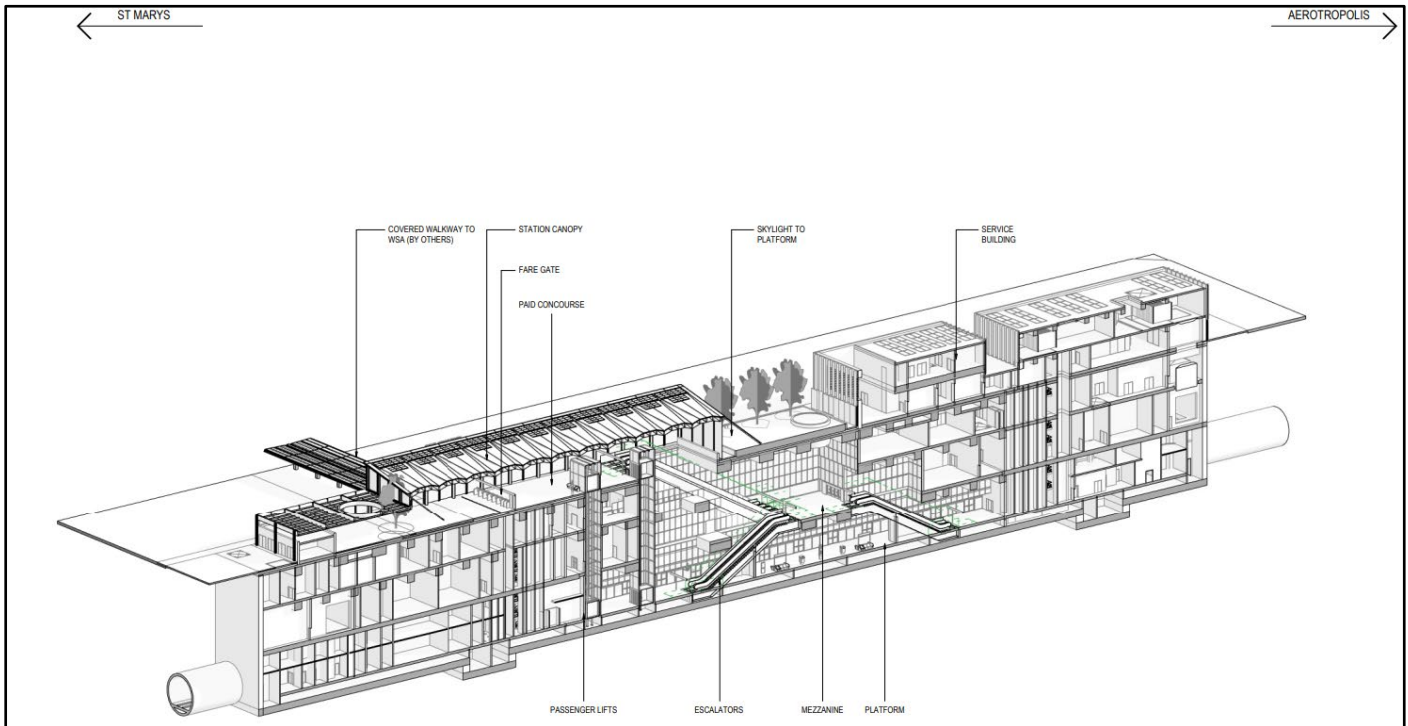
ATL STATION ARCHITECTURAL ELEVATIONS (PRELIMINARY)
